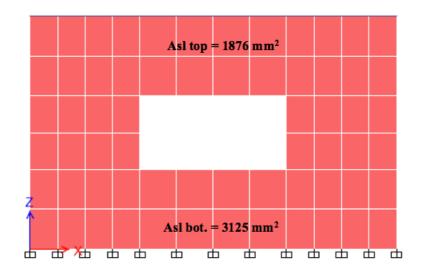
19: The effect of opening on the steel reinforcement of shear walls
